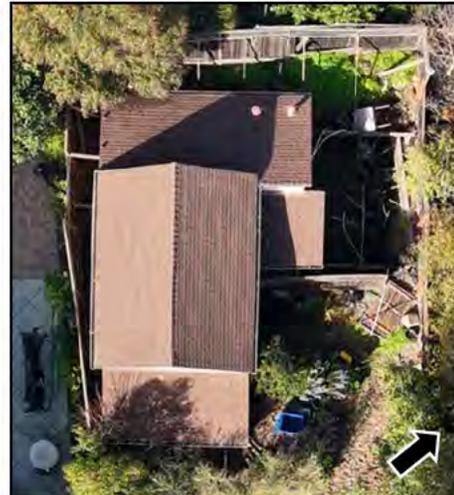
Overall showing shoring attached to fence as well as partially excavated basement.
